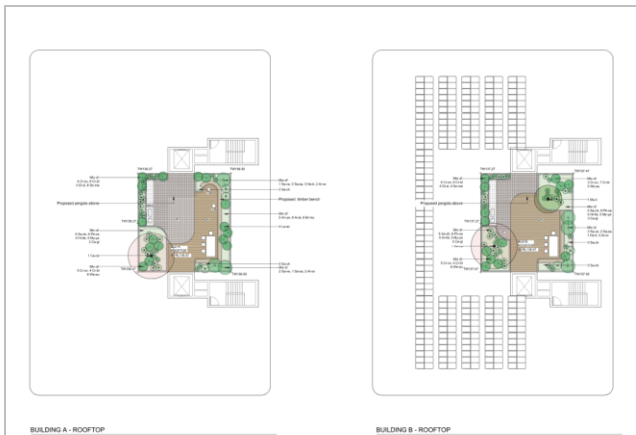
Previously proposed Buildings A & B Rooftop landscape plans (Source: Studio IZ)
